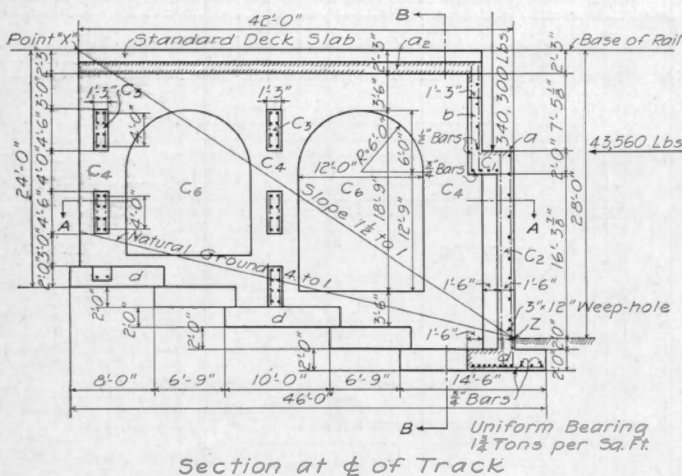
Type C₁; Reinforced Concrete U Abutment, Covered.
